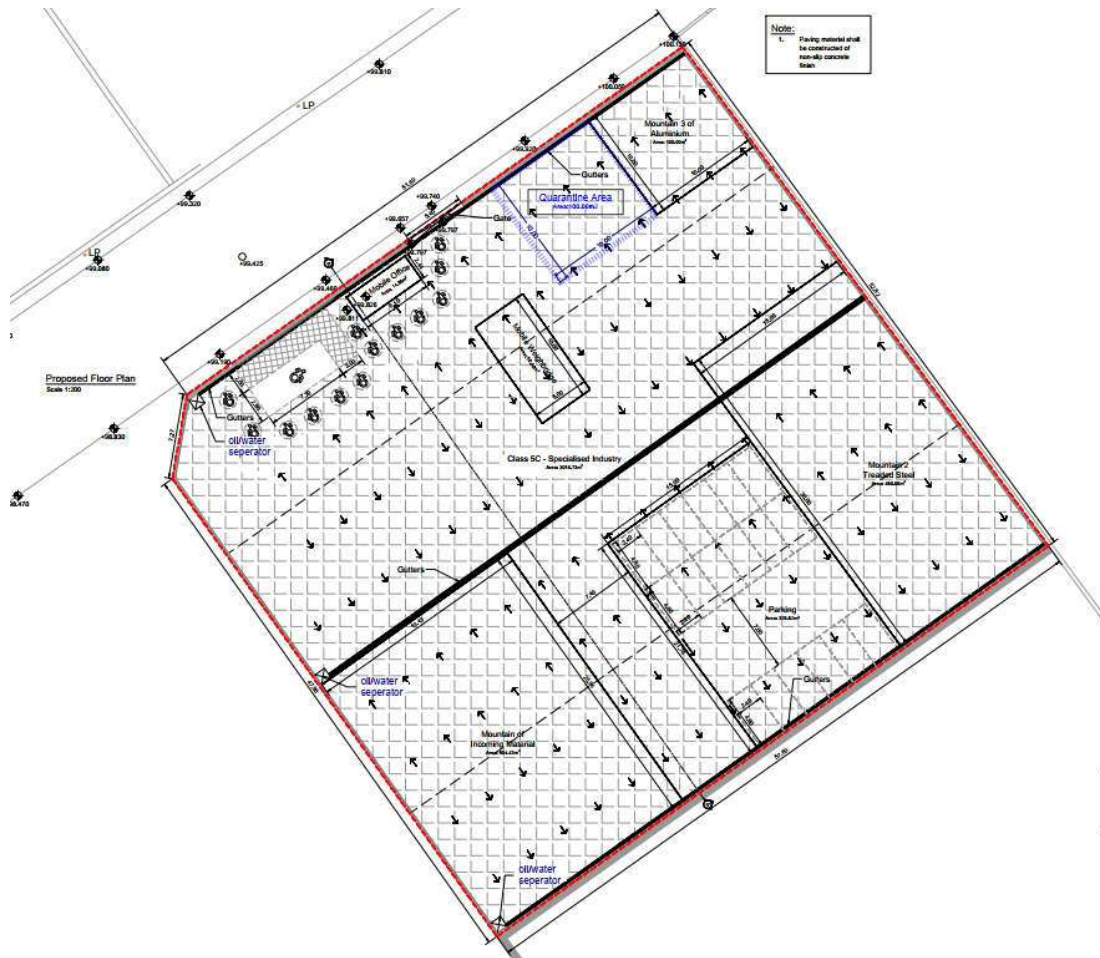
Site layout of the permitted installation to undertake the activities specified in condition 1.1.1. The extent of the site is indicative and shall not be used for interpretation purposes.
